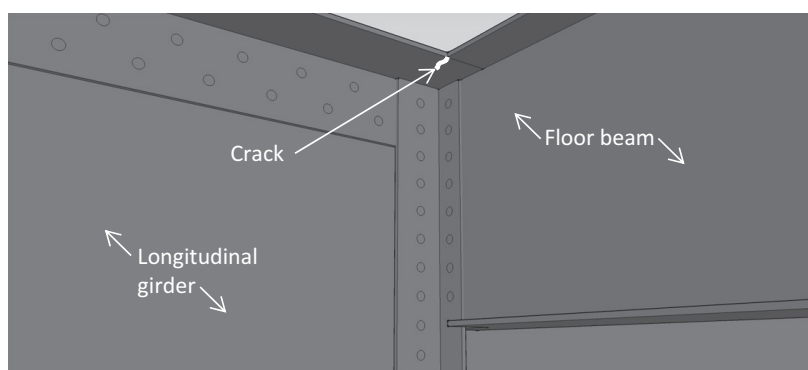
Three-dimensional schematic of crack at weld between the floor beam and longitudinal girder.
